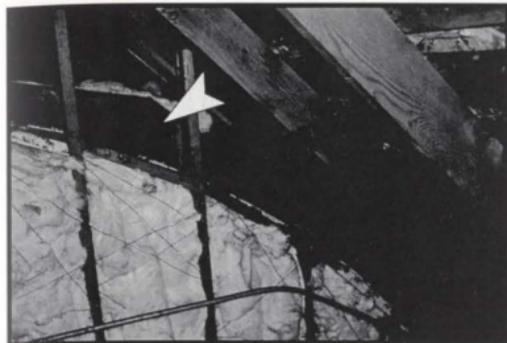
Photograph showing the framing for the Lodge Room's barrel vaulted ceiling.
